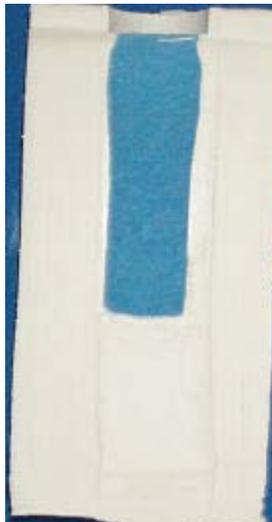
Cross Section of the specimen after testing under foundation type loading.
